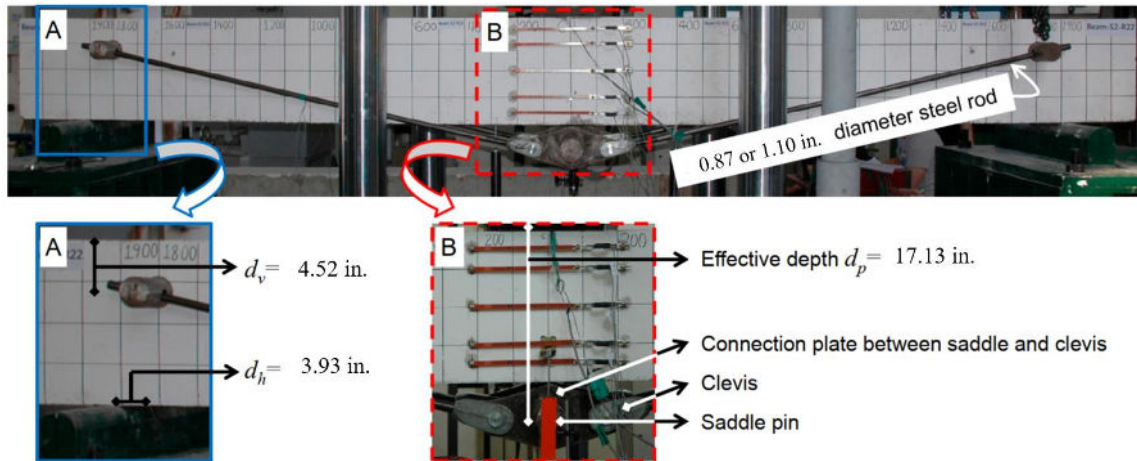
Details of beam specimen (Lee et al., 2018).
